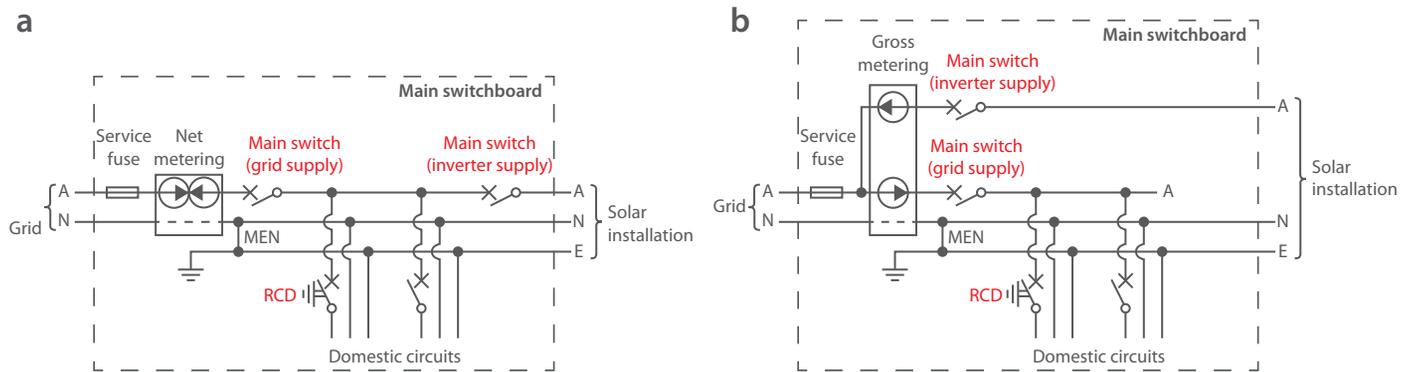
Wiring schematics for a) a net-metering arrangement and b) a gross-metering arrangement. MEN: multiple earth neutral.
